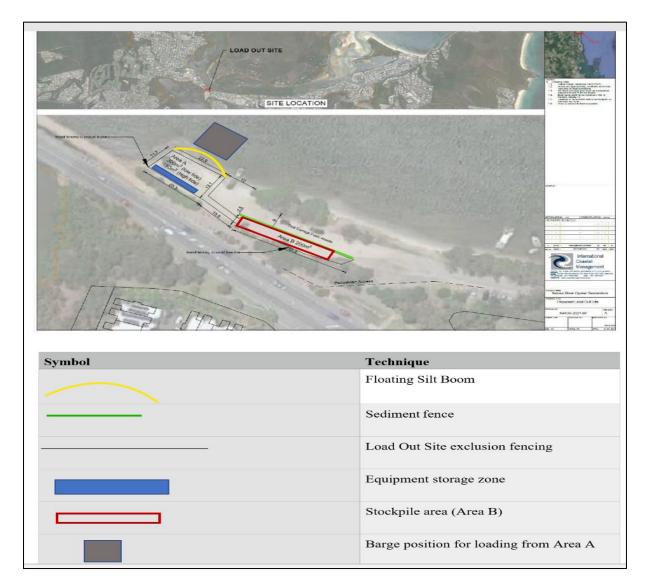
Construction load-out site located on Hilton Esplanade, Noosaville.
